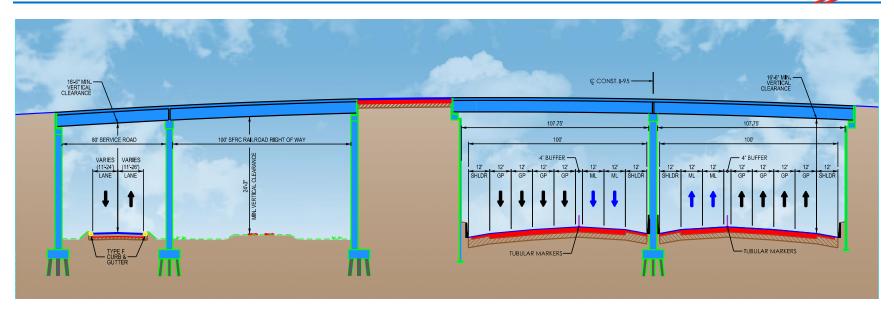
Typical Section – I-95 and SFRC/CSX Railroad underneath Lantana Road
